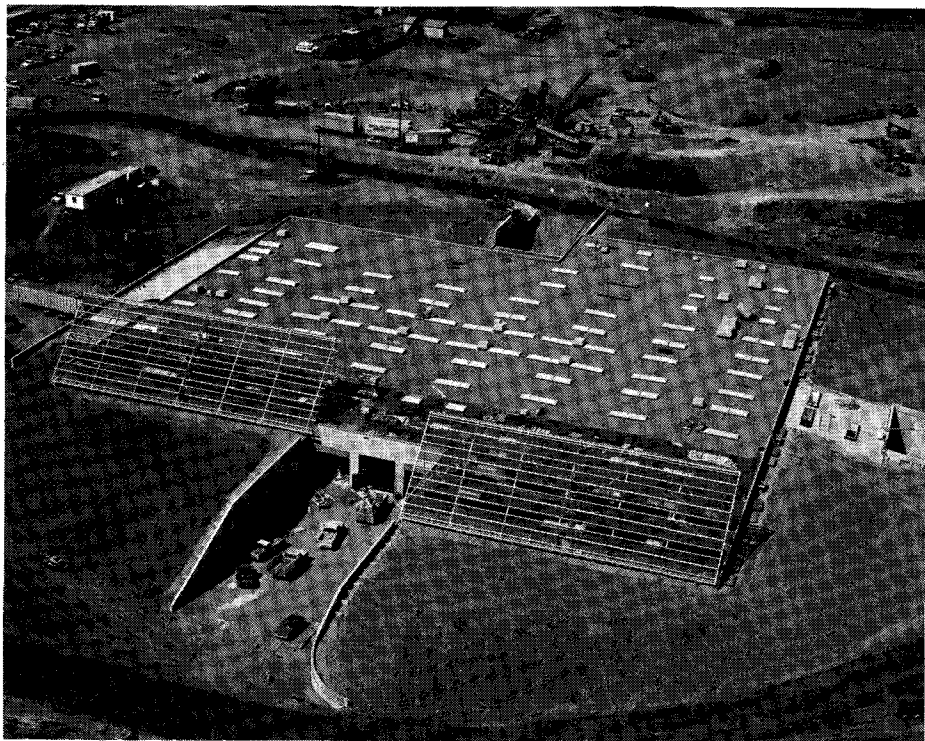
Backfilled completed structure looking from south face. Contrast this picture with earlier photographs (Figs. 2 and 3) of mined terrain.
